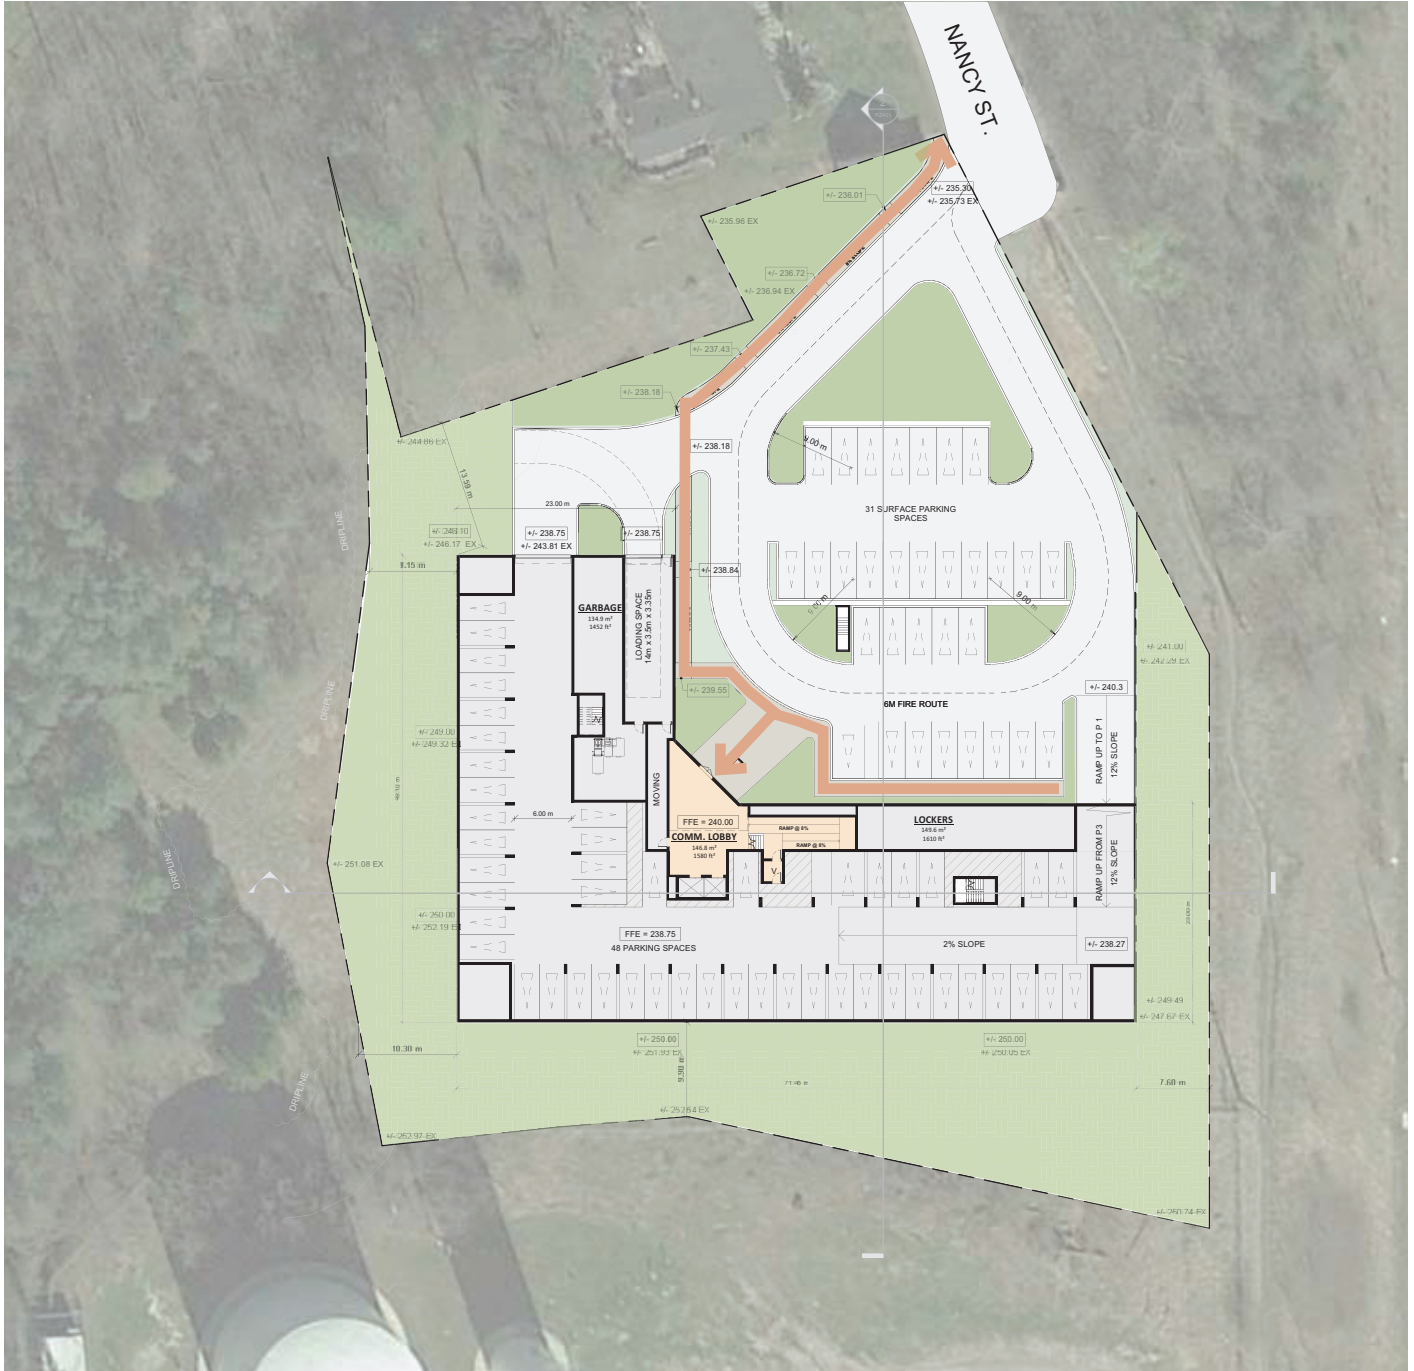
Site Plan prepared by Turner Fleisher Achitects.
